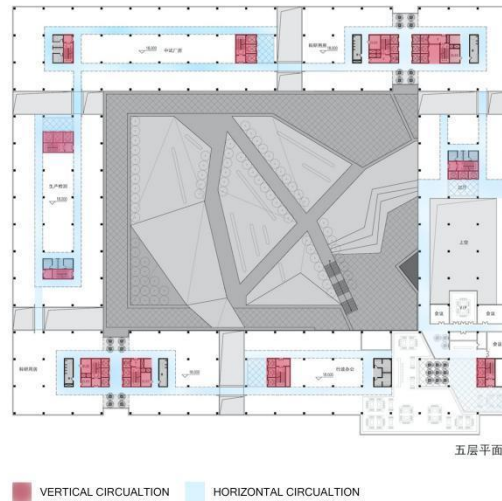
Floor Plan (Source: ArchDaily),(illustration: Author,2021)
